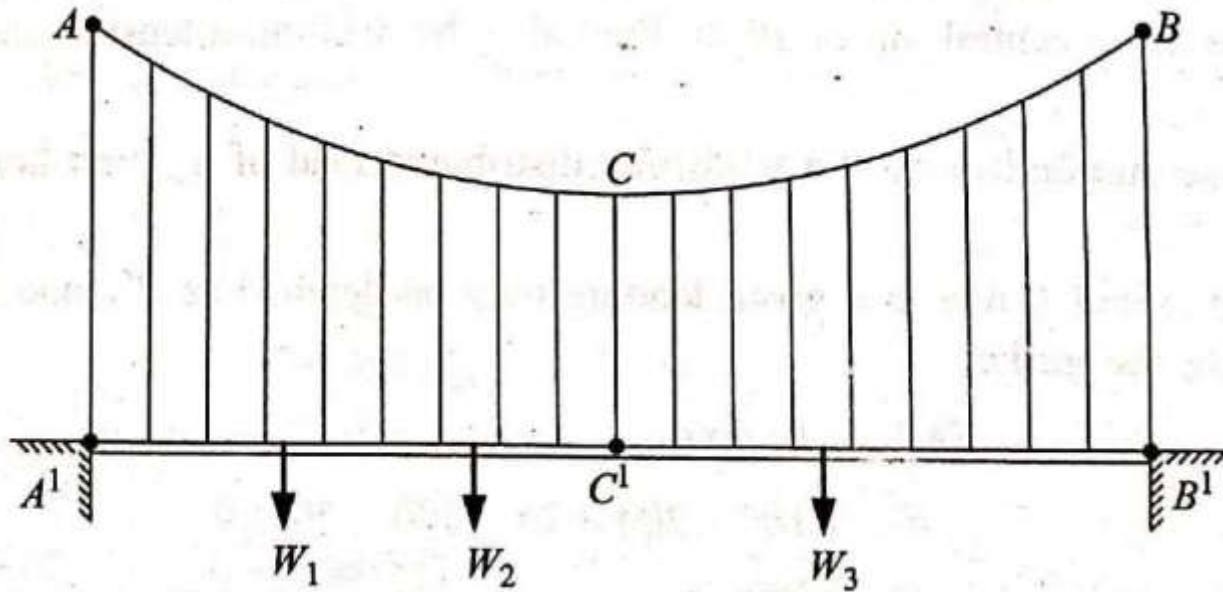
Typical suspension bridge with three-hinged stiffening girder
